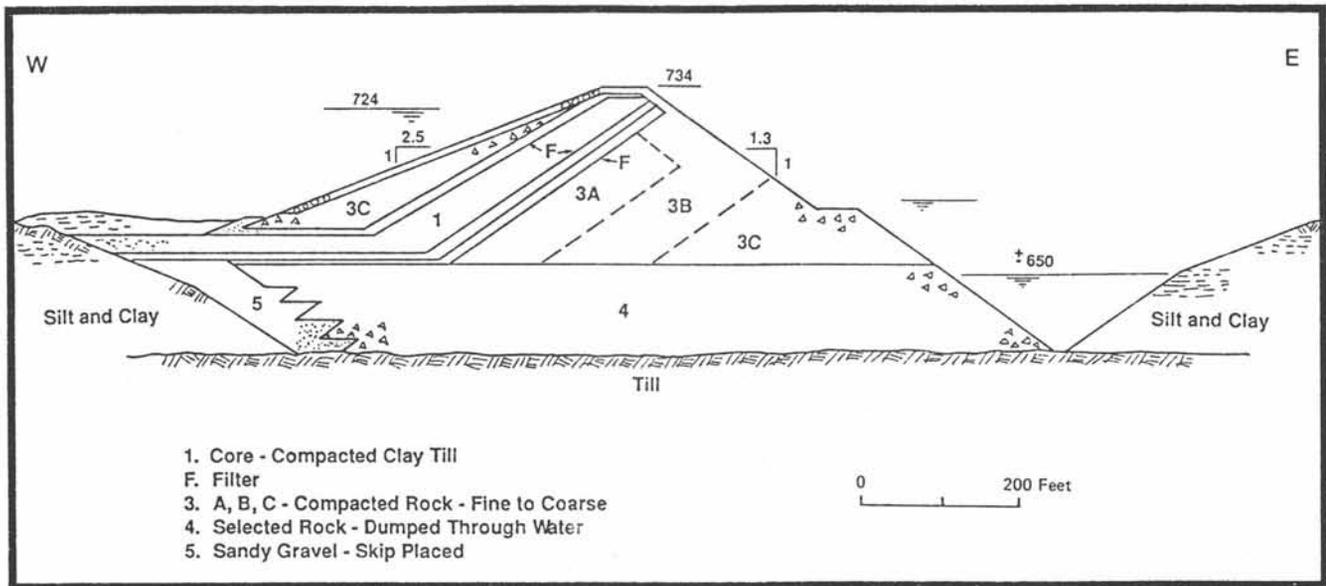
Section through the West Pass Dike. The section indicates the type of material in the dike and sediments on which the dike rests. Sketch by W. F. Swiger.
